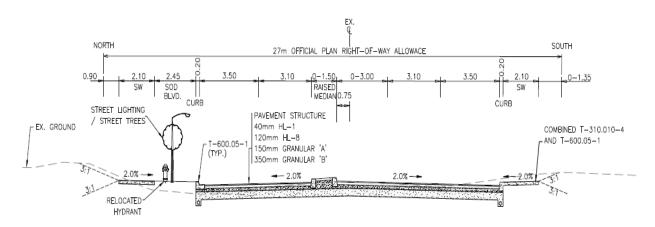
Alternative Design 4B: Typical Cross Section at Markham Road
